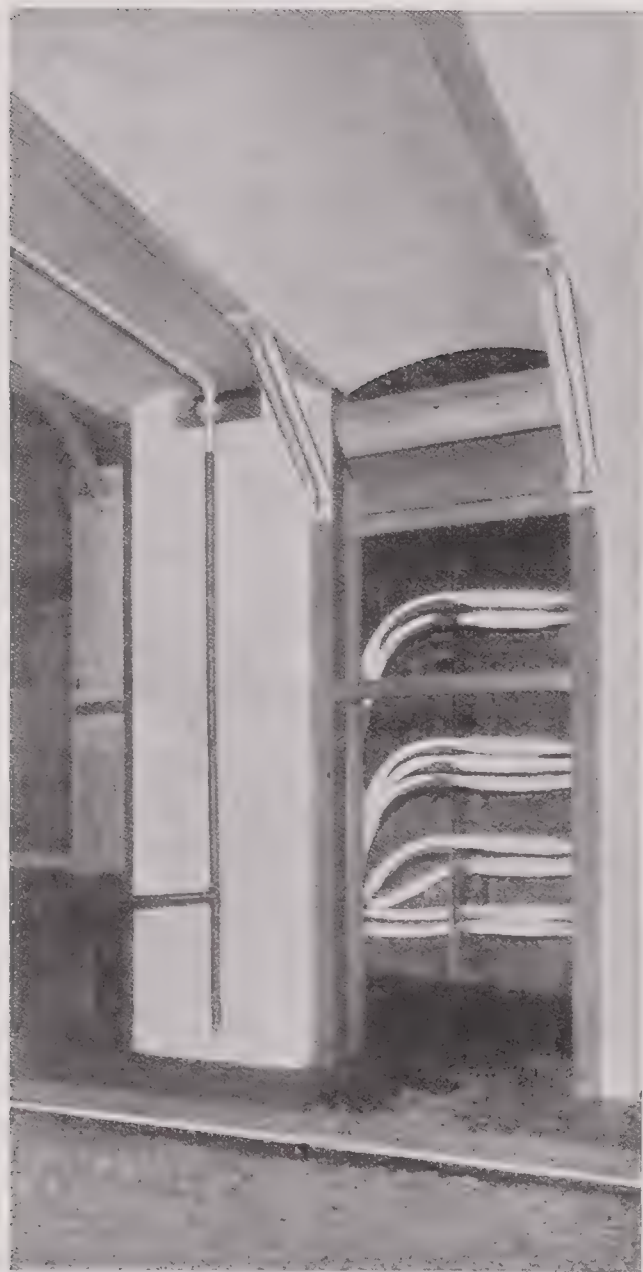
NEW YORK SUBWAY: ARRANGEMENT OF CABLES IN MANHOLE.
